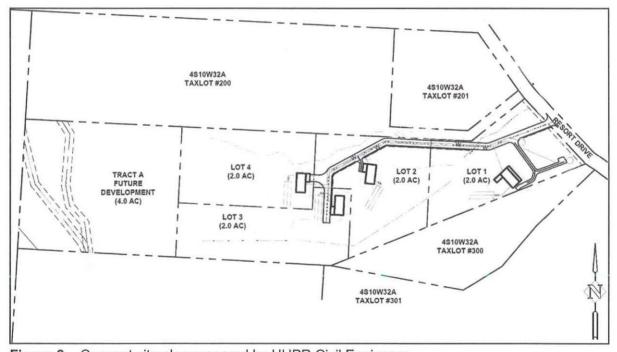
Concept site plan prepared by HHPR Civil Engineers.
